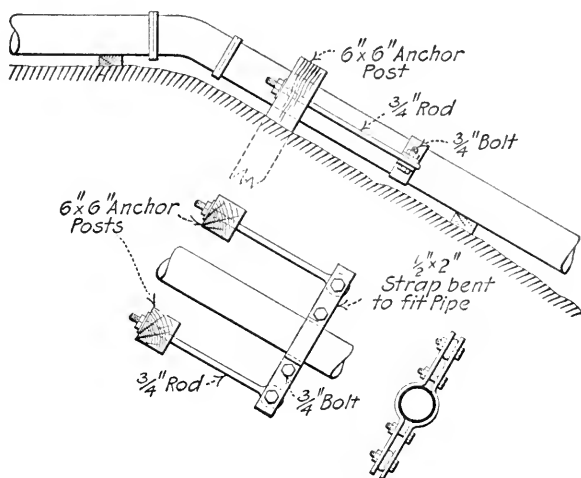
ANCHOR POSTS, BOLTS AND YOKE.
